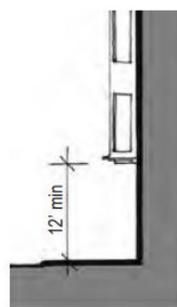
Bay Windows - minimum clear height above finished sidewalk
